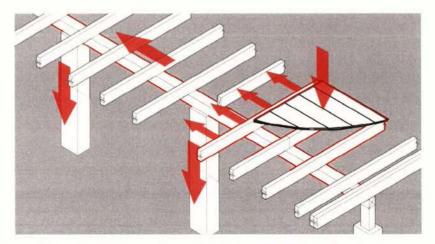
Method of Line Load Transfer through Sub-floor Framing to the Ground
